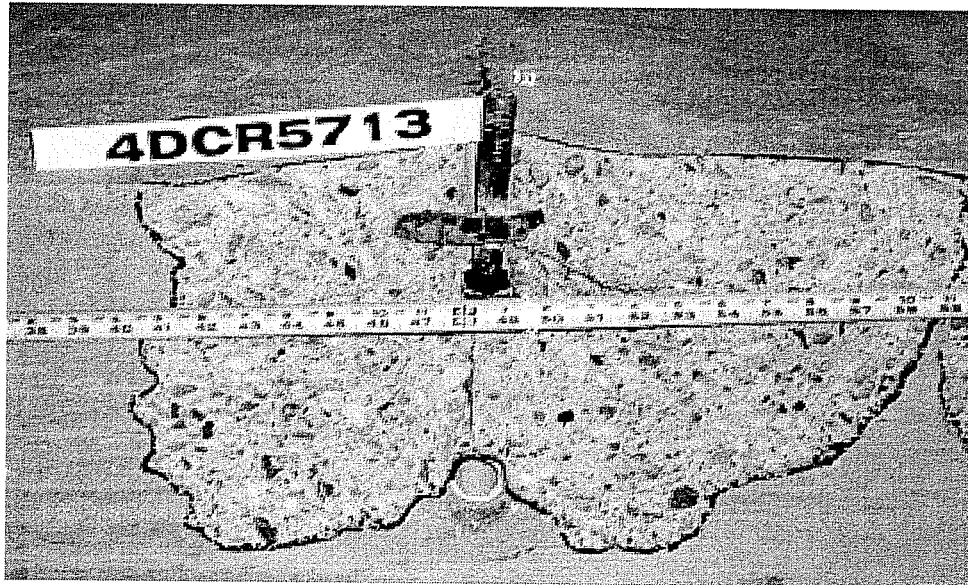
Typical Failure Cone for Cast-in-Place Single-Anchor Connection with Far Hairpin Loaded in Shear
